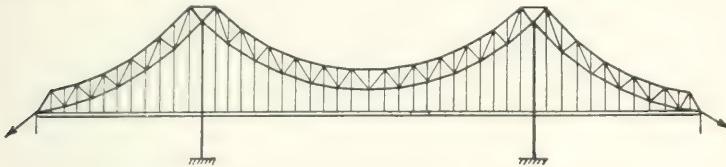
Hingeless Braced Chain Suspension Bridge.
